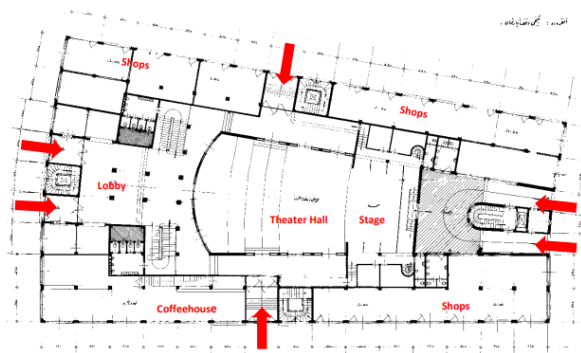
Ground floor plan of the building (Originally from the Archive of the General Directorate of Foundations, adapted by Yalçın & Kula, as cited in Yalçın & Kula, 2024, p. 438).
